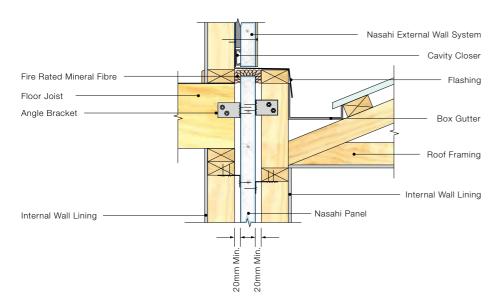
TYPICAL PARTY WALL CORNER
